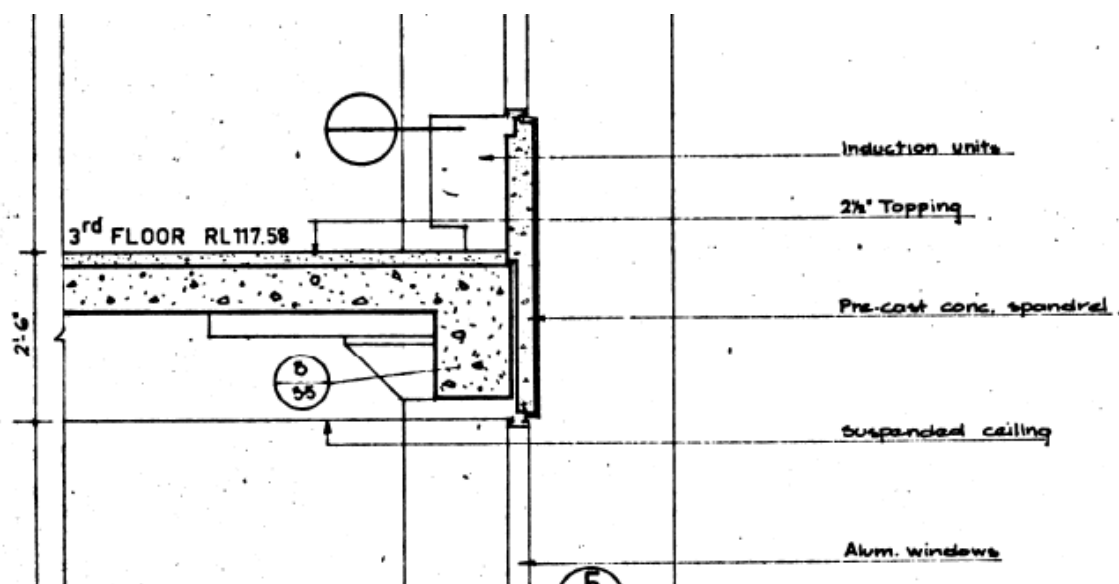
Drawing 38528-48, Building Application Plan, showing pre-cast concrete spandrel (BAP).
